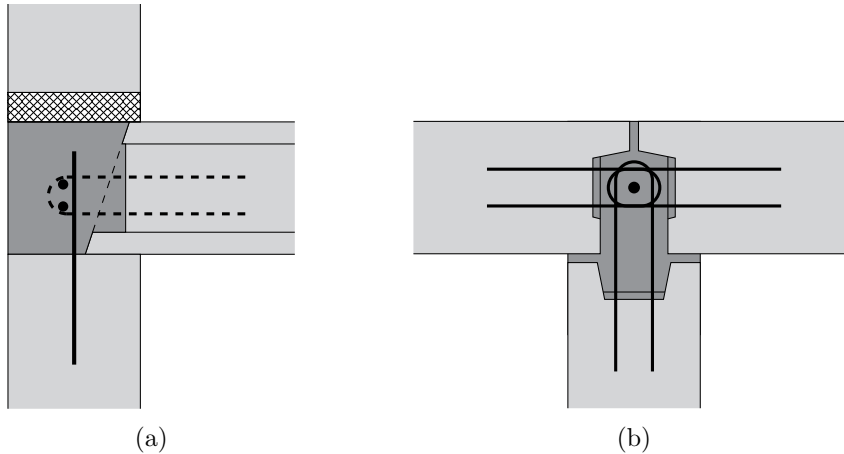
a) Vertical section of slab-to-panel joint reinforced with U-bar loops and embedded rebars. b) Horizontal section of panel-to-panel T-joint reinforced with U-bar loops extruding from all three panels.
